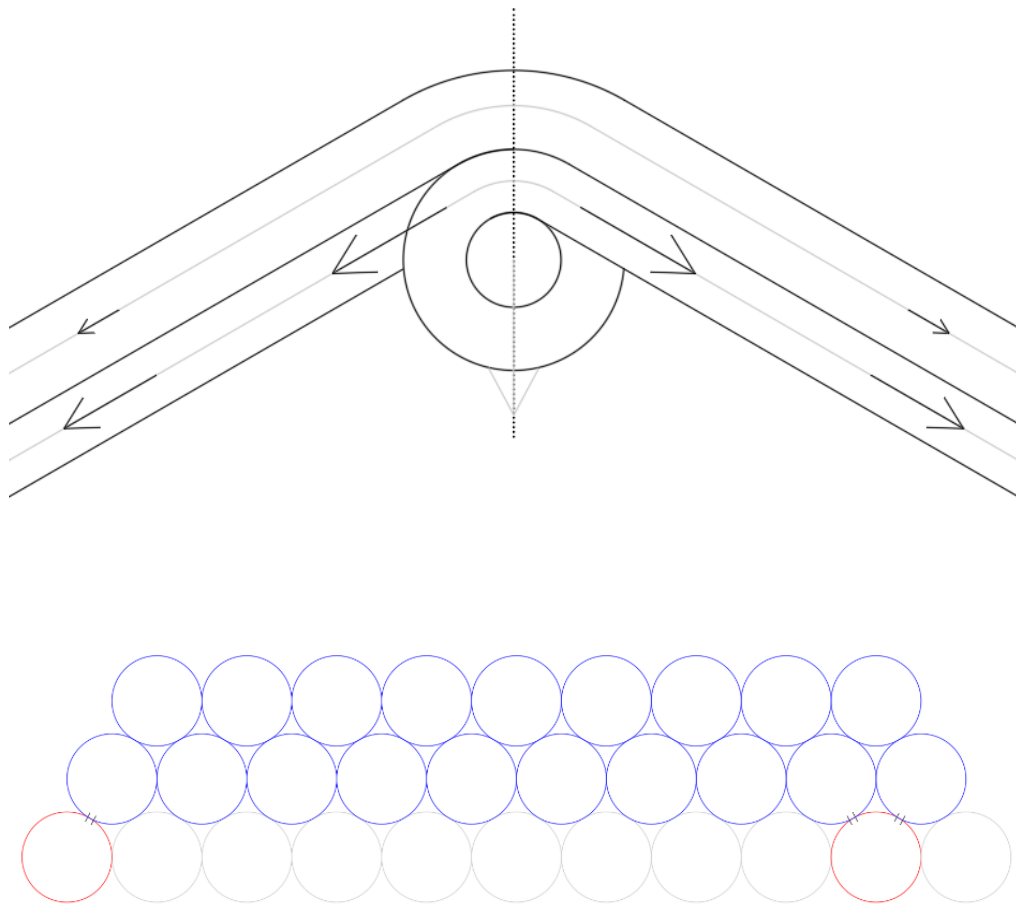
top: top view of connection to threaded end, bottom: section of connection to threaded end
